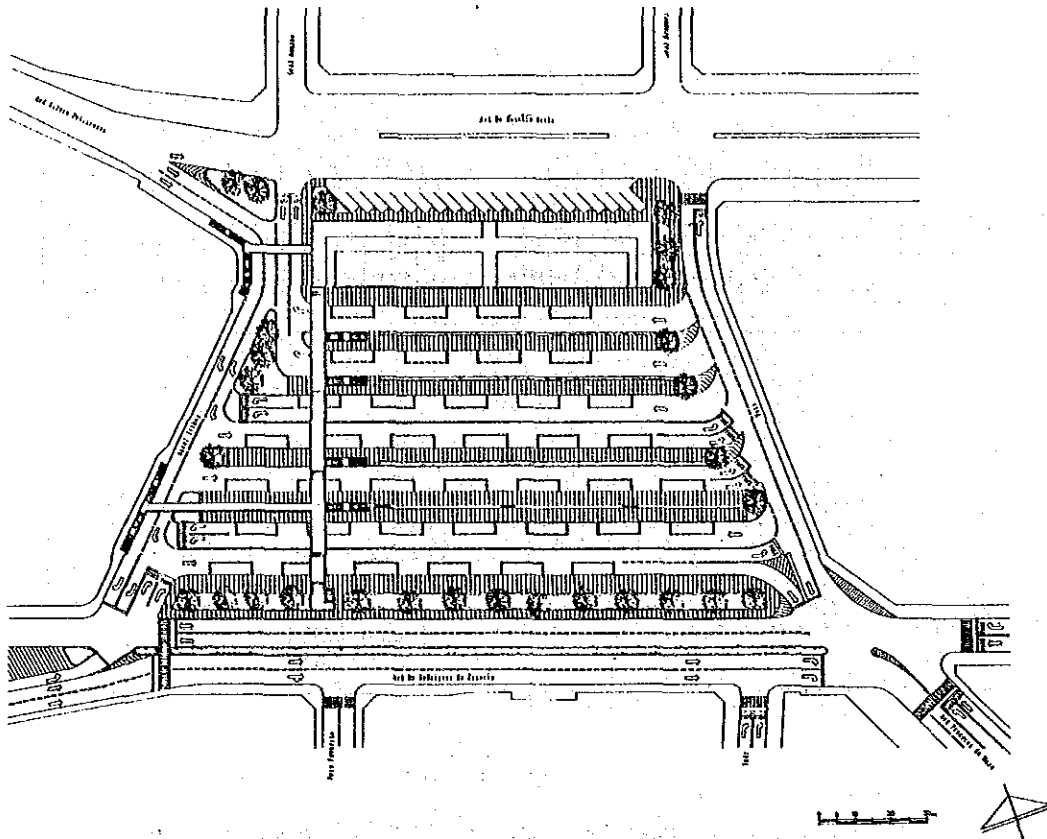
BUS TERMINAL PLAN (ALTERNATIVE NO. 1)
